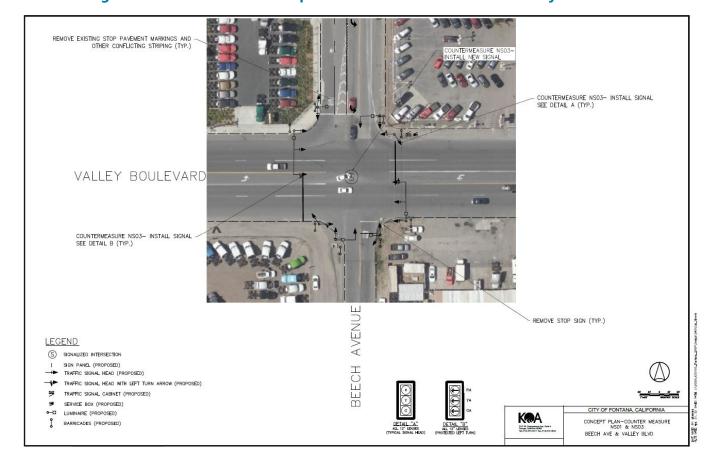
Recommended Improvements – Beech Avenue & Valley Boulevard
